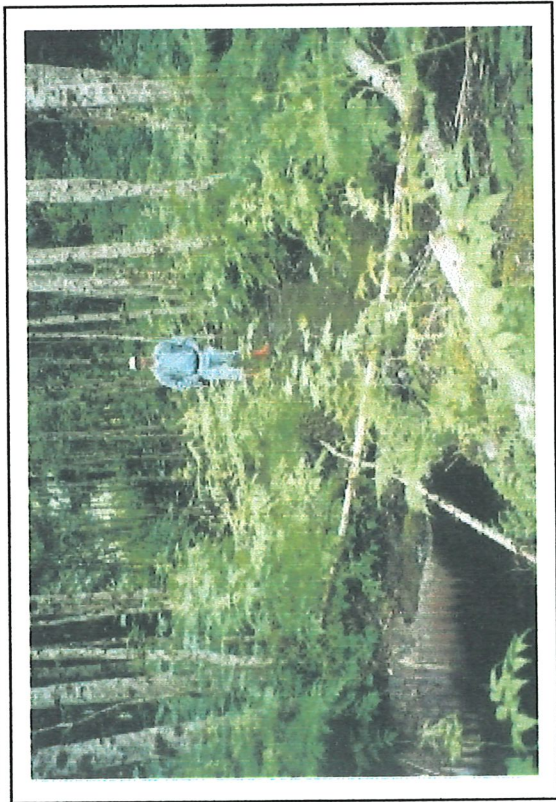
Summer 1999. Middle section of channel before construction with blocked culvert (foreground) which diverted flow down spur road.
